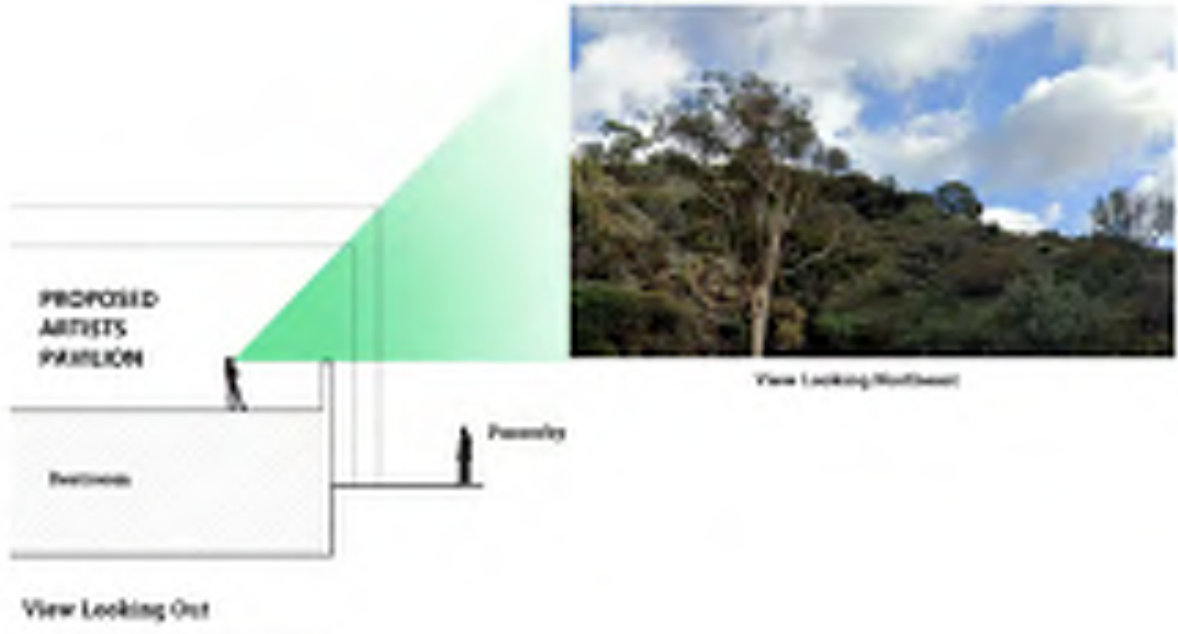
Proposed view from the Artists Pavilion to the surrounding native plant hillside areas
